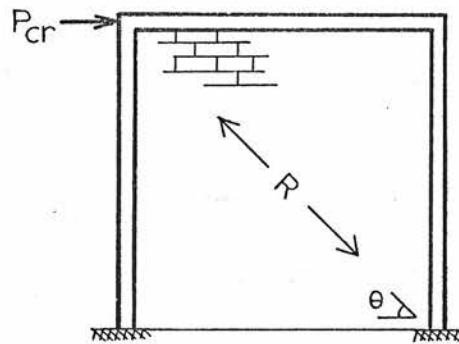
Approximation of masonry infilled frame at cracking load
